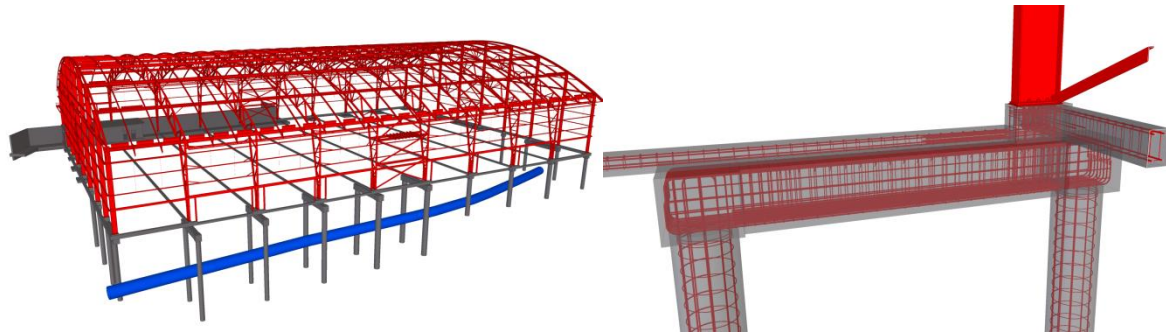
Interaction between steel column, steel brace, tie beam and transfer grade beam spanning over sewer 30ft below
